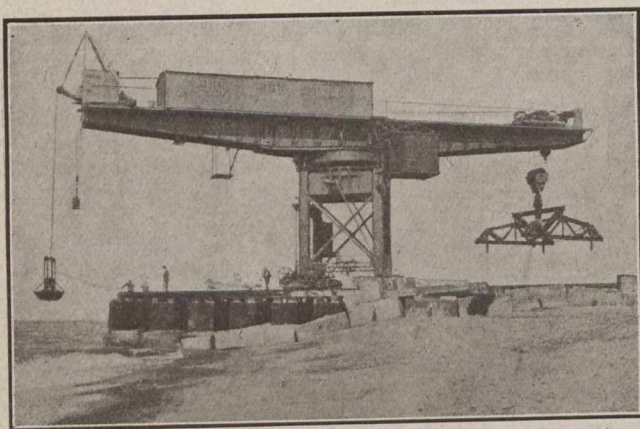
110-ton Crane Used in Placing Sections and Blocks.
